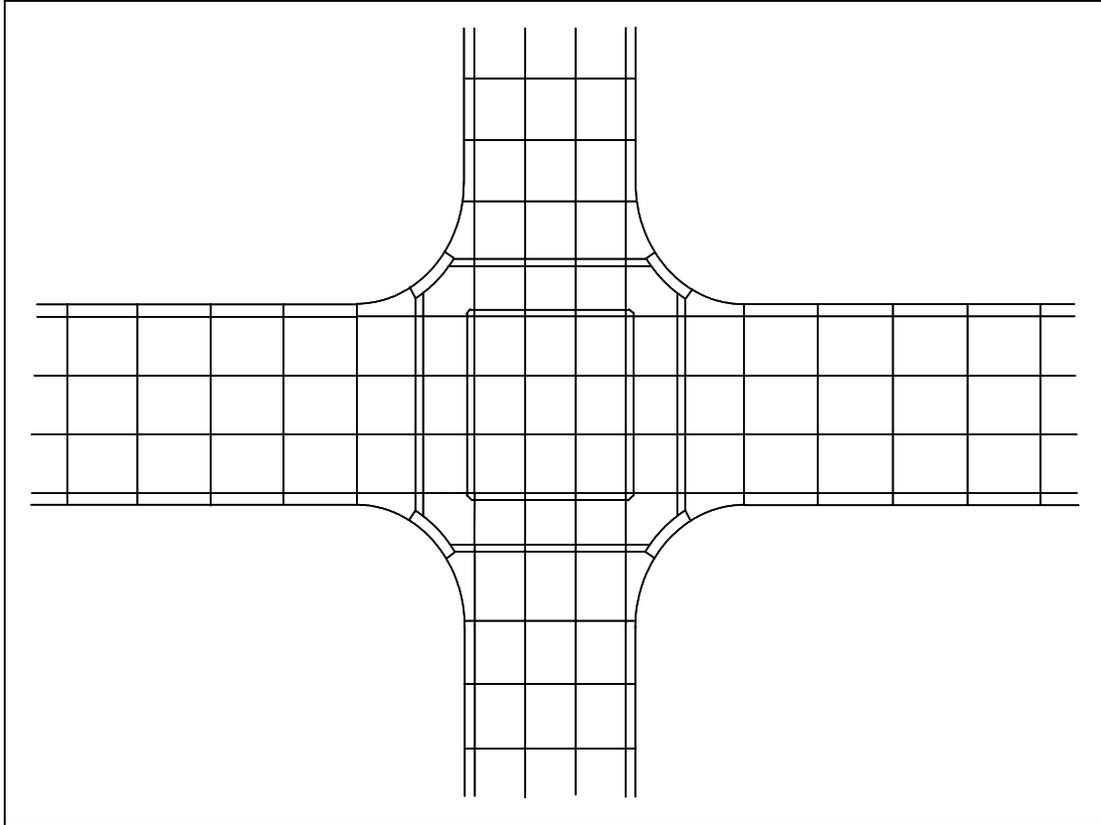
Typical joint layout for colored crosswalk with stamped brick boundary
